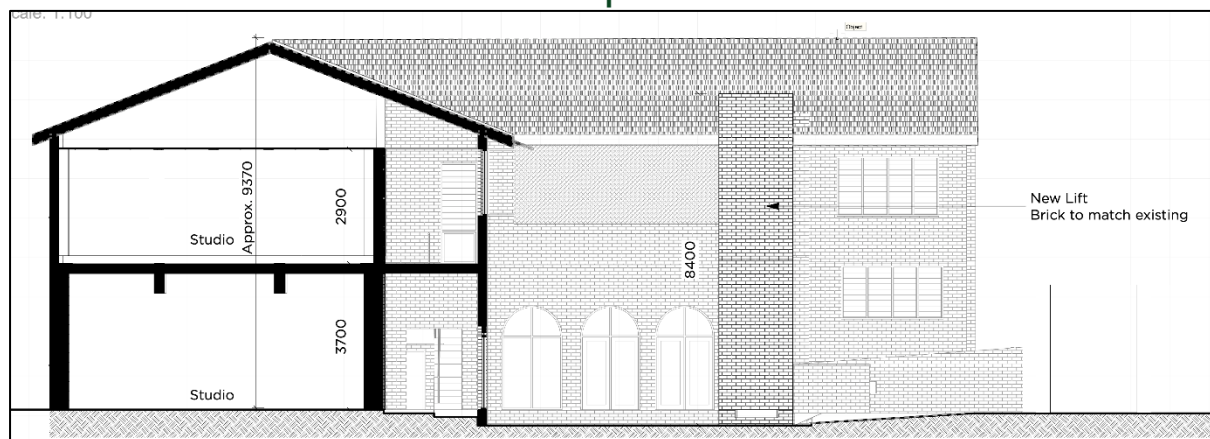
48 Victoria Road Building Heights (PMDL, 2021)
